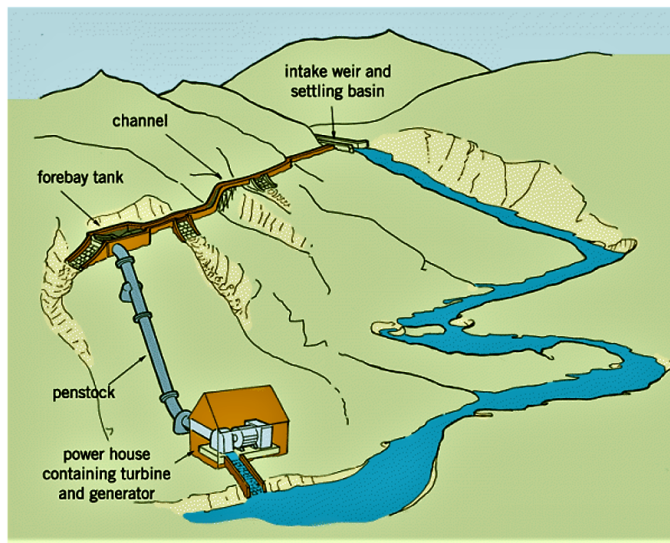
Typical scheme of a run-of-river micro hydropower plant. Showing the intake, channel, forebay tank, penstock, and the powerhouse. Obtained from [26]
